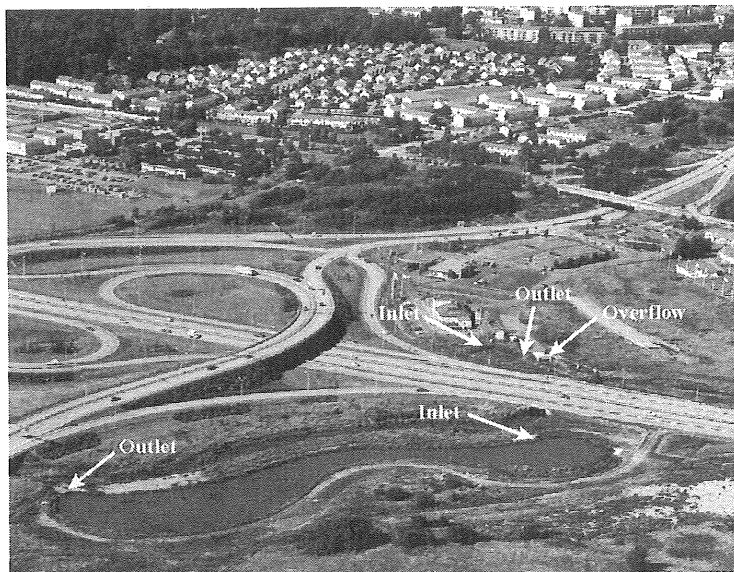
Photo over the two Järnbrott ponds with inlets and outlets indicated
